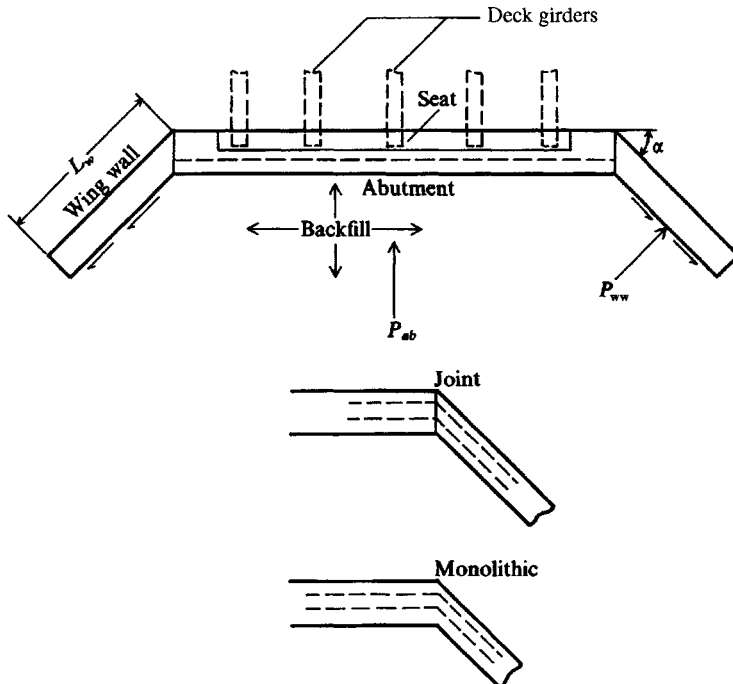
Bridge abutment and wingwall earth pressures and methods of construction. As abutment tilts forward, friction develops on wingwalls as shown if wall is rigidly attached.
